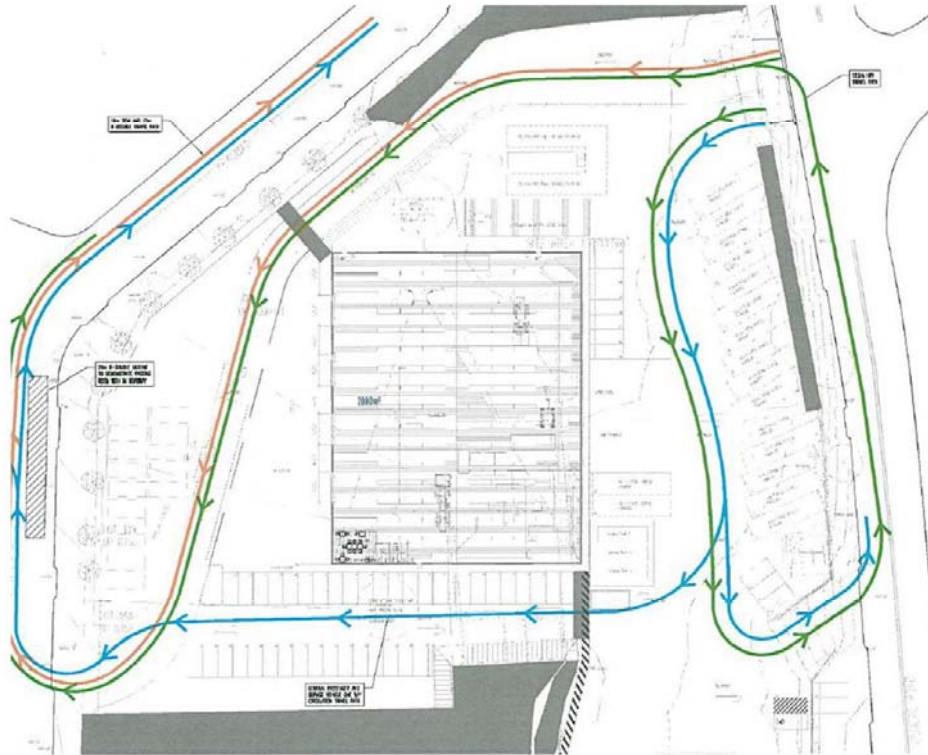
Site Plan showing the proposed traffic circulation off Gilmore Road through the site onto Bowen Place.
